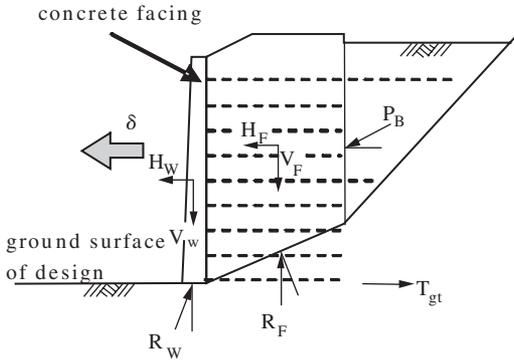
Modeling of GRS retaining wall for evaluation of base sliding.
